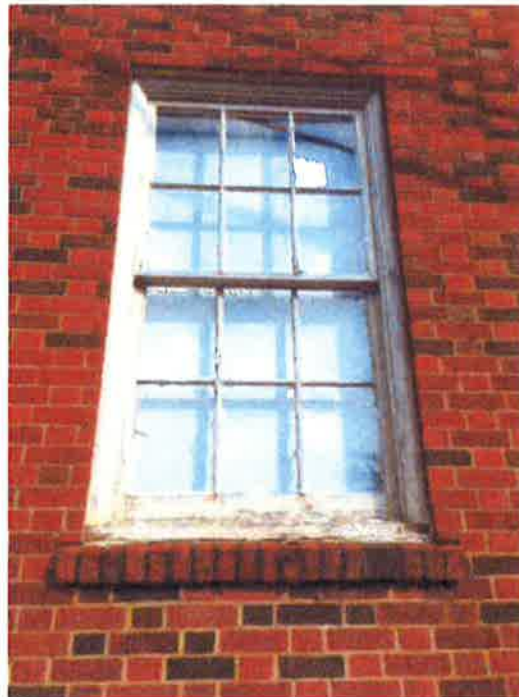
Typical Type A, E & F Window Configuration - Exterior
